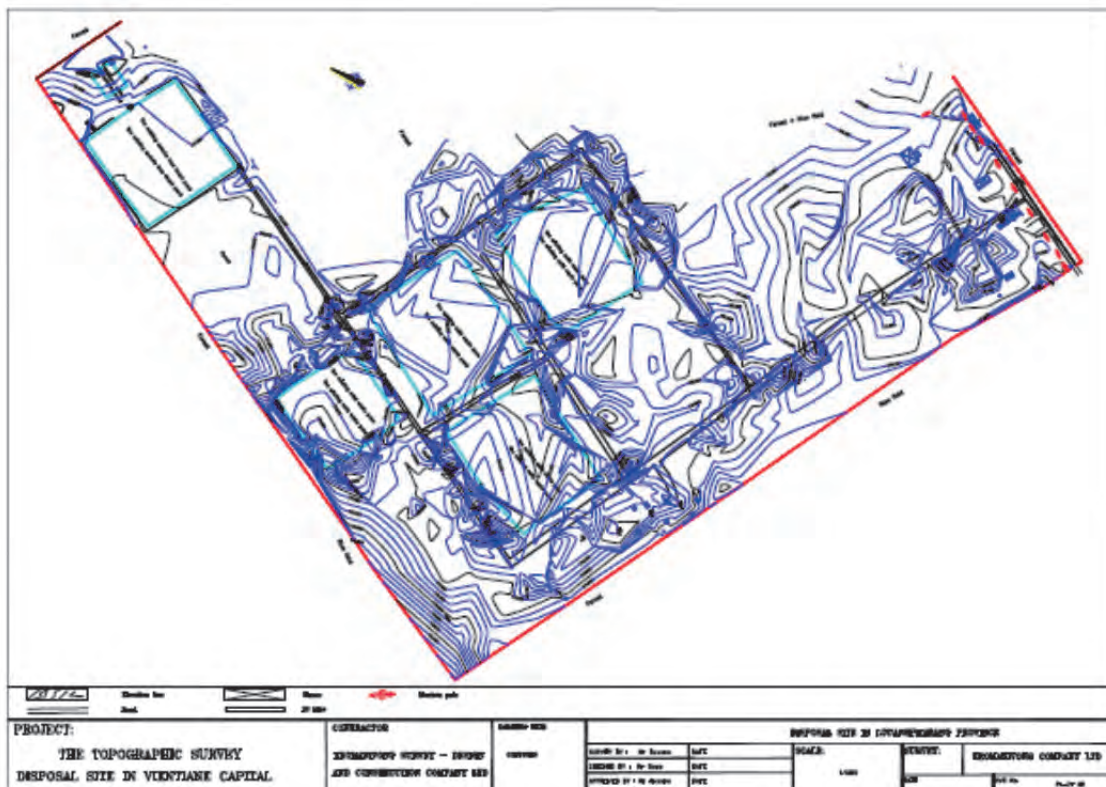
The boundary of pilot area at KM32 existing final disposal site
